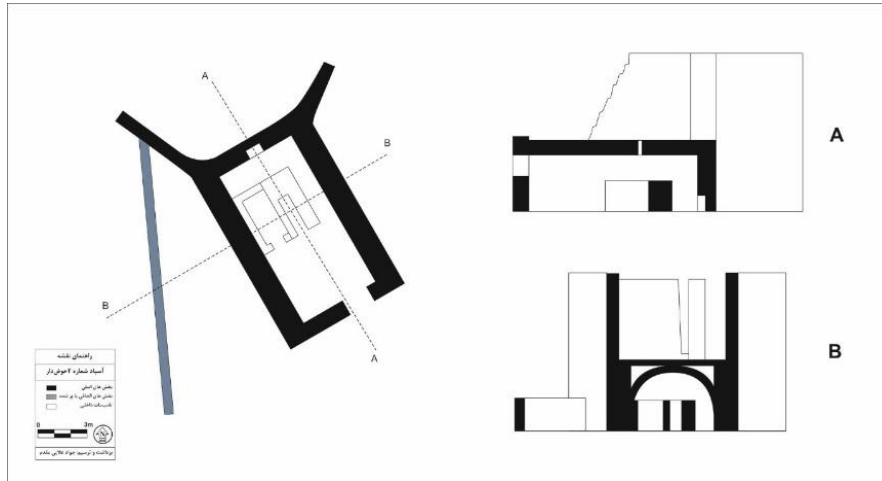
Plan and cross-sections of the windmill (Asbad) No. 2 of Hozdar (small Asbad) in the southeast of Qala Machi (authors, 2023)
